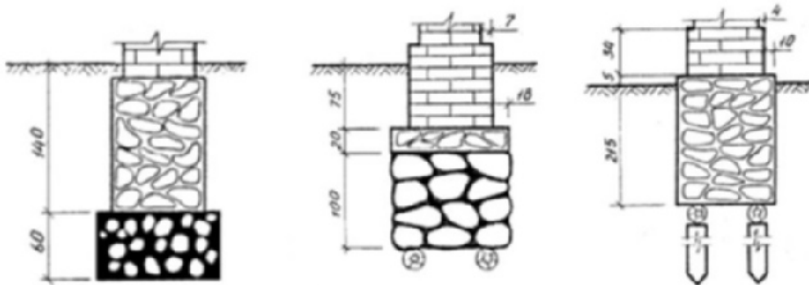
View of the foundations of old buildings (Mangushev R. A. et al. 2018). On the left – a foundation, the lower part of which is made of granite boulders; in the center – a combined foundation, built in the base-ment part of brick on a rubble limestone foundation, the lower part of which is made of granite boulders, which were laid on wooden longitudinal sleeper; On the right – a rubble foundation on a pile base of wooden piles.
